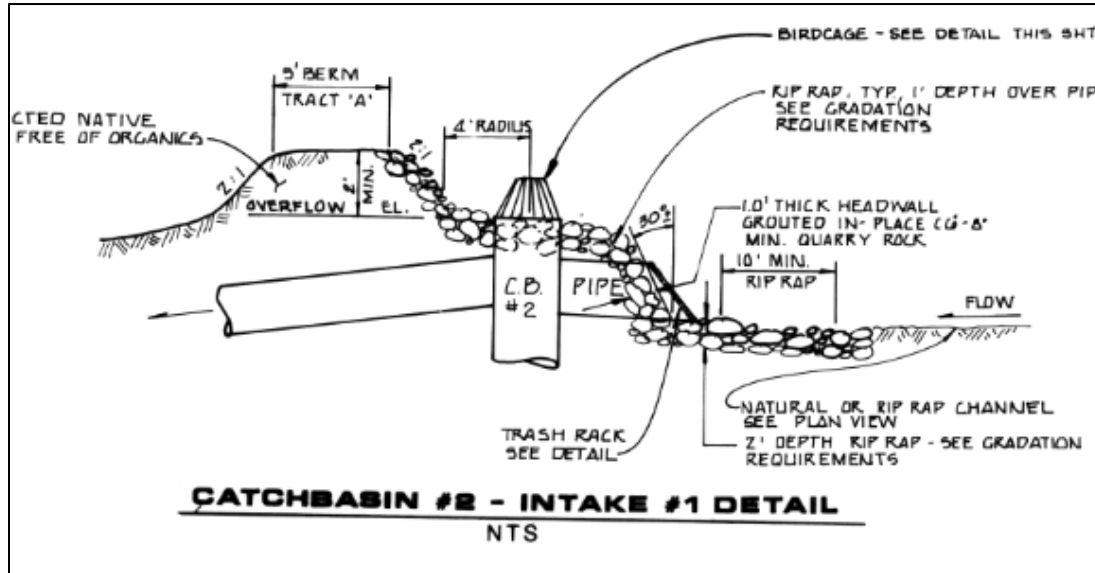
Diagram of Stormwater Facility at the Time of Construction (GeoDimensions 1991)
